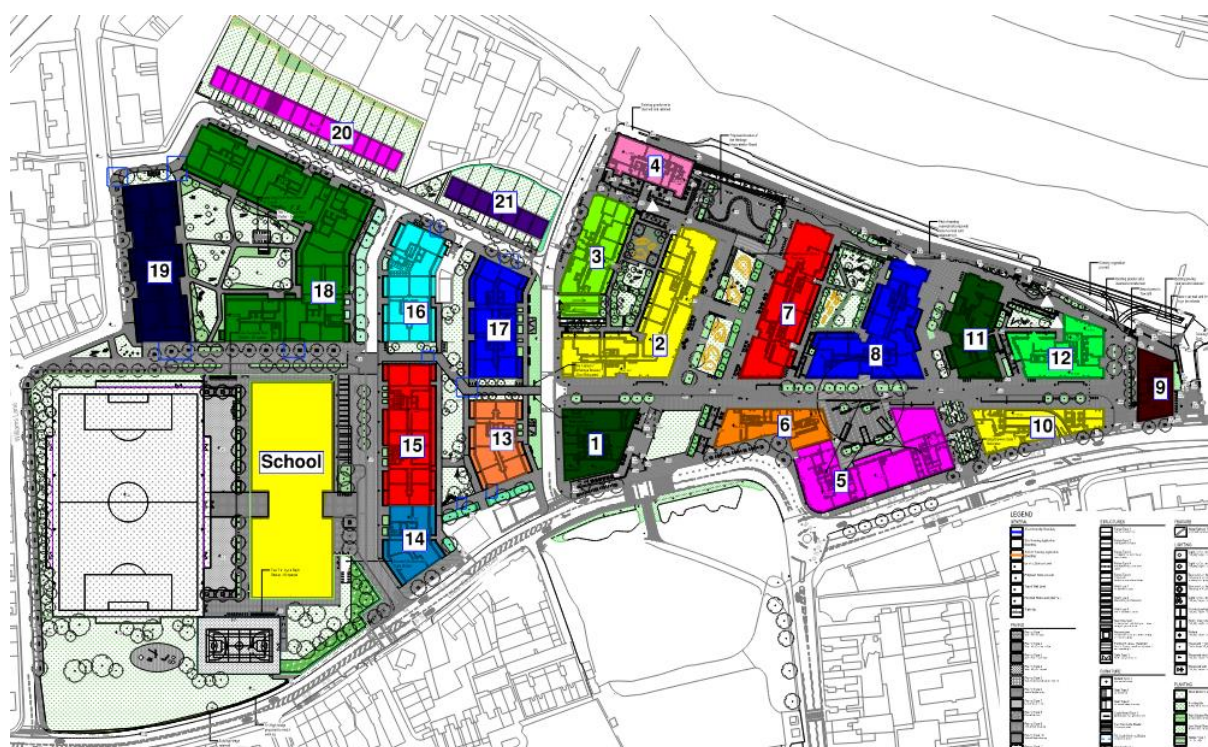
Proposed Stag Brewery Site Numbering Plan.
